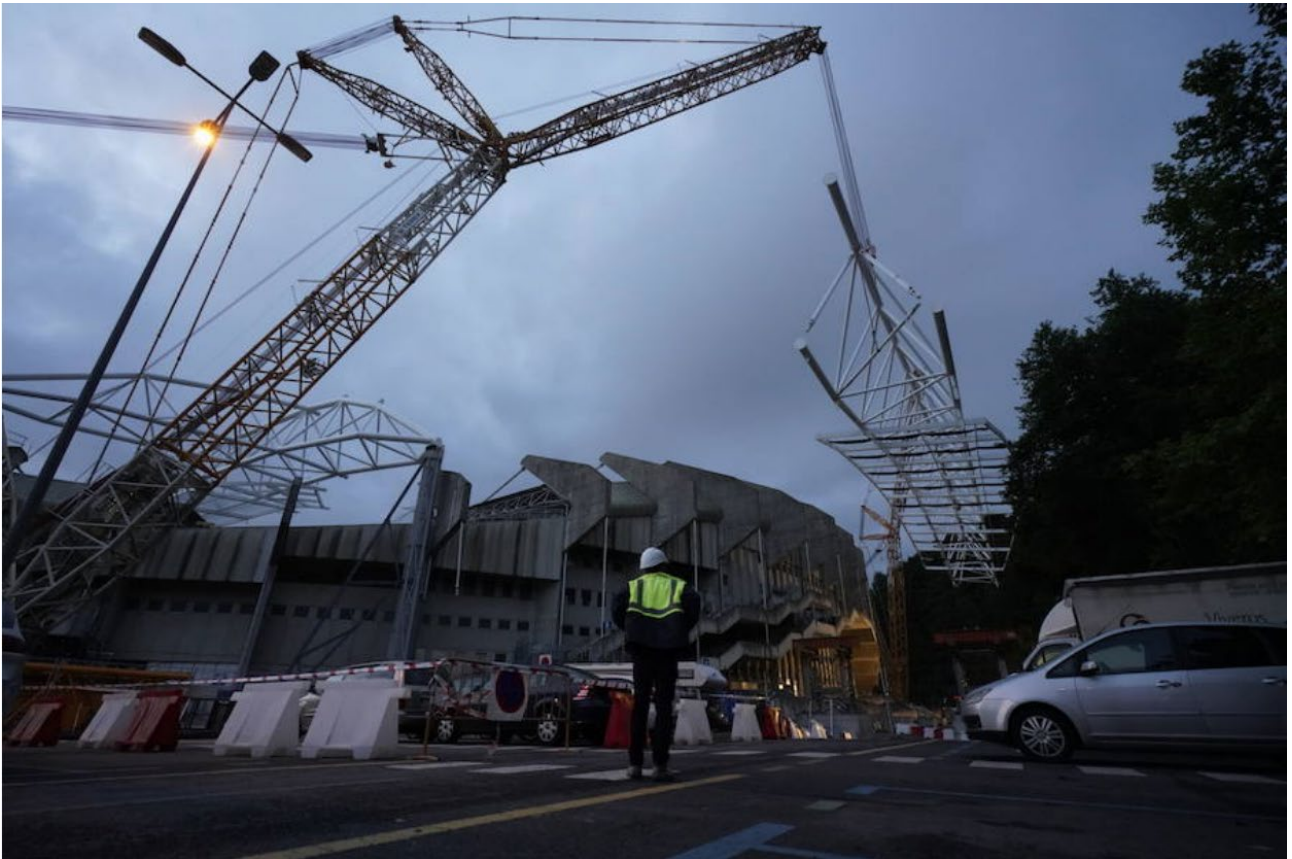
Intermediate position of the cranes with the truss still out site the stadium.
